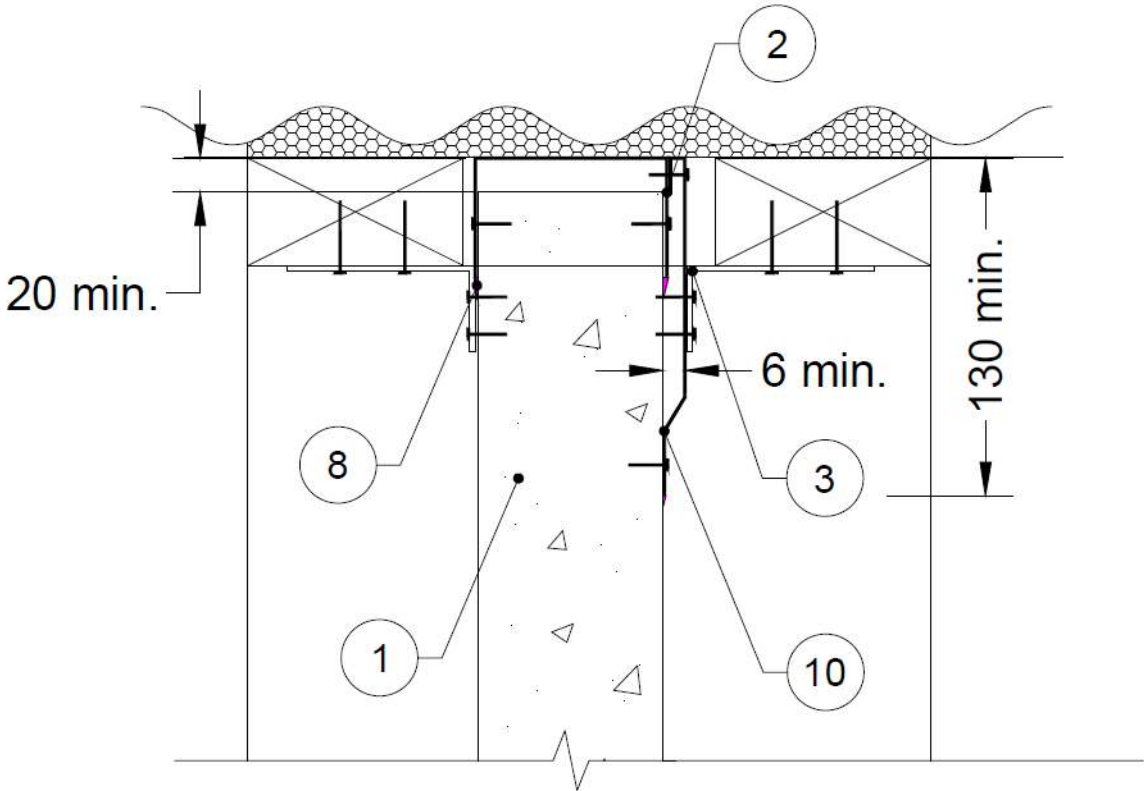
Metal Flashing Protection of Barrier above Ceiling for 51mm and 78mm Panel
